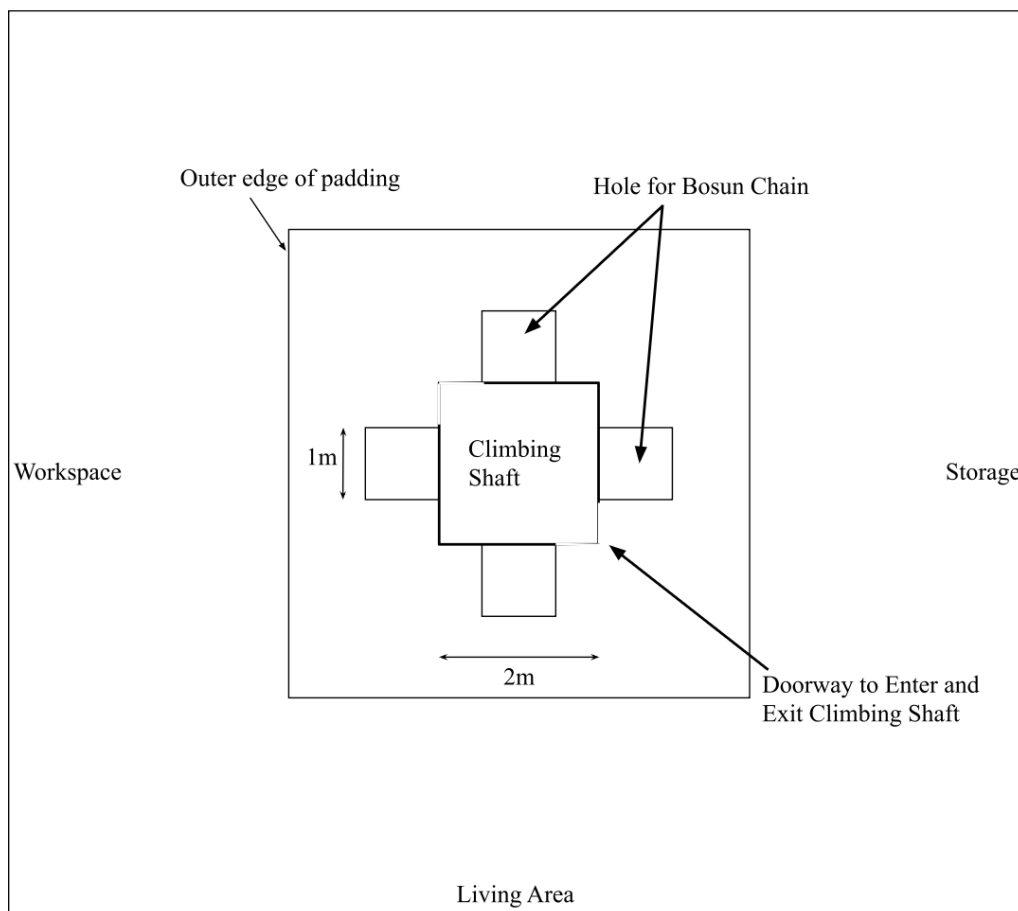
Climbing Wall and Bosun Chair Floor Plan
